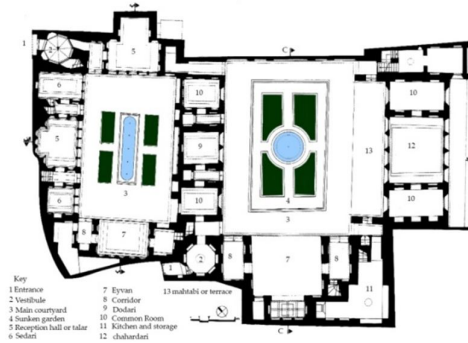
Ground floor plan and list of spaces in a house of the dry and tropical region which have been built in the form of sunken garden
